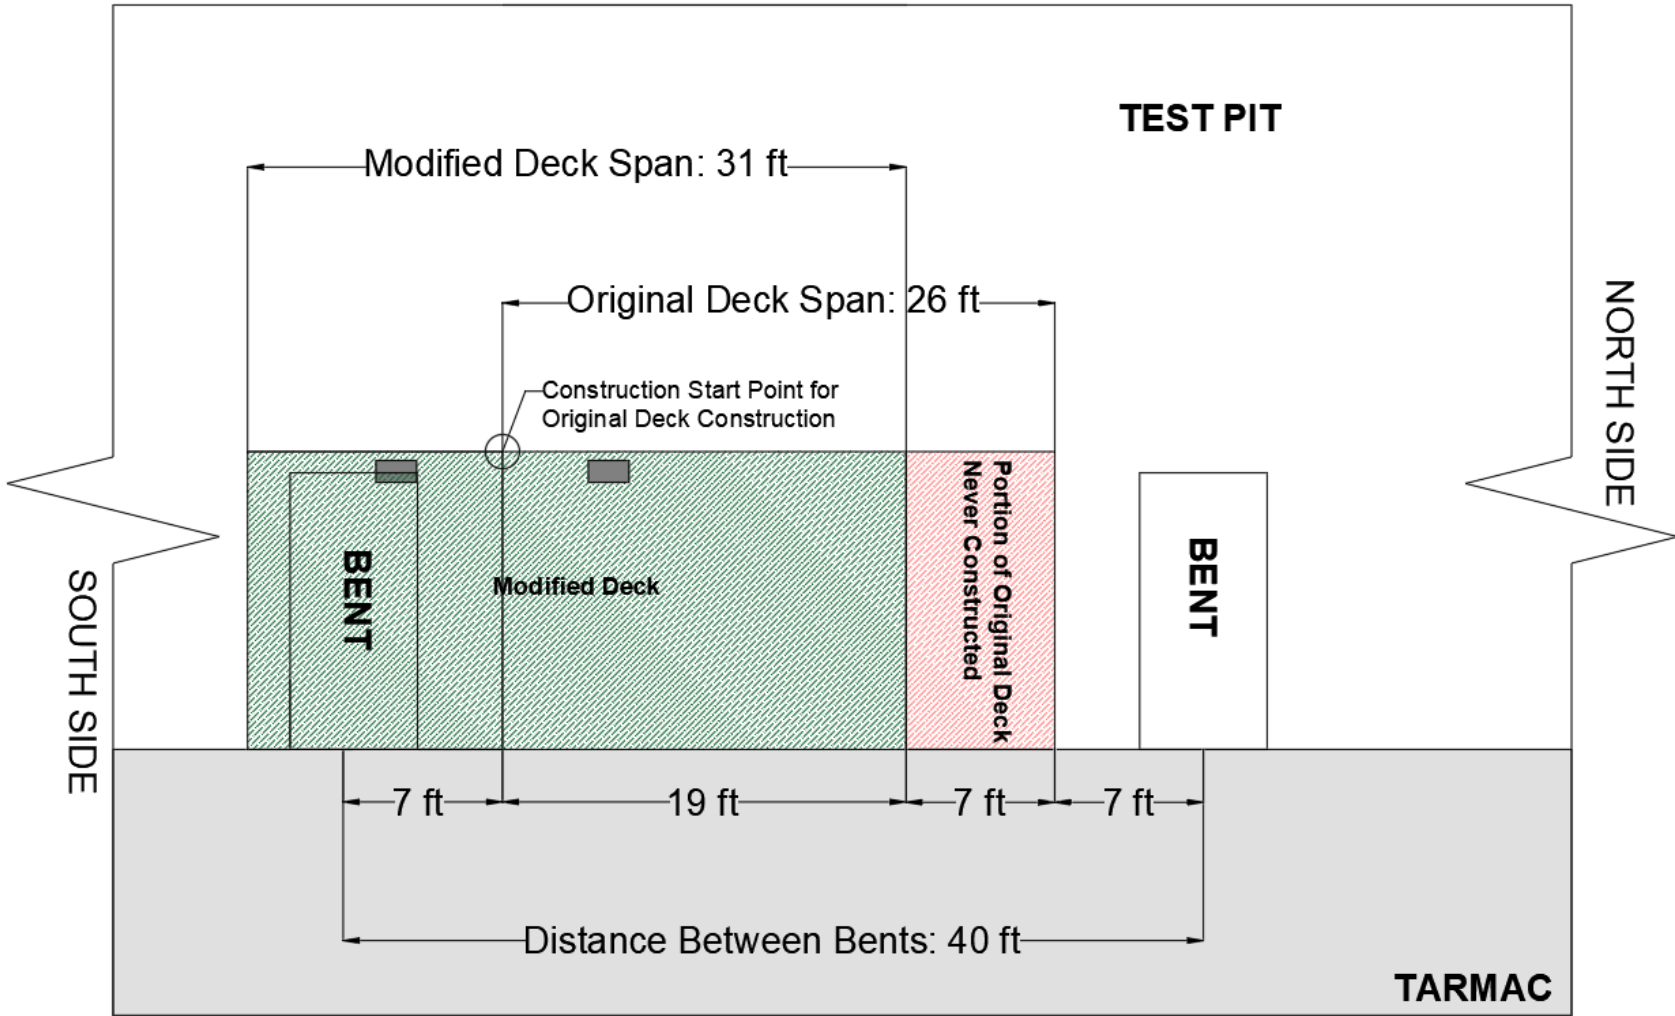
Plan View Sketch of Modifications to Nail-Laminated Deck Length and Location
